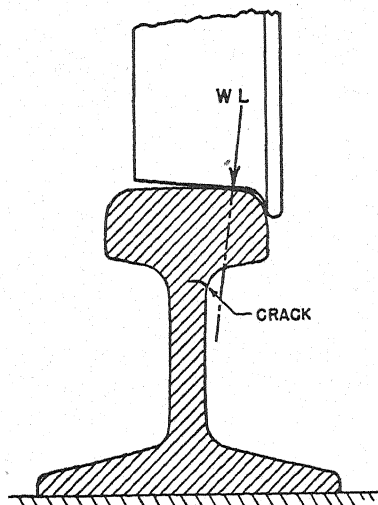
Fatigue Crack in the Head-Web Fillet of a Railroad Rail.
